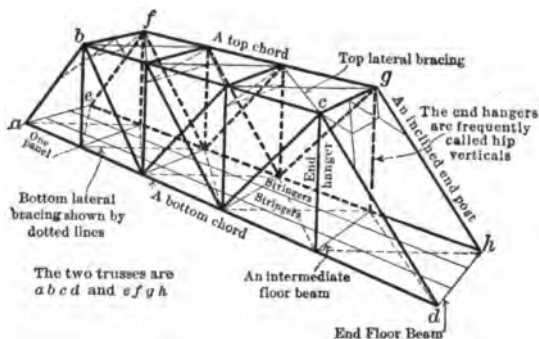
Framework of a Through Railroad Truss Bridge.
